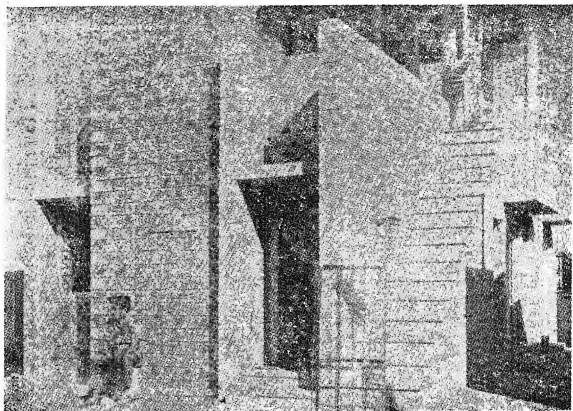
PHOTO NO. I LOW COST HOUSE WITH STONE MASONRY
